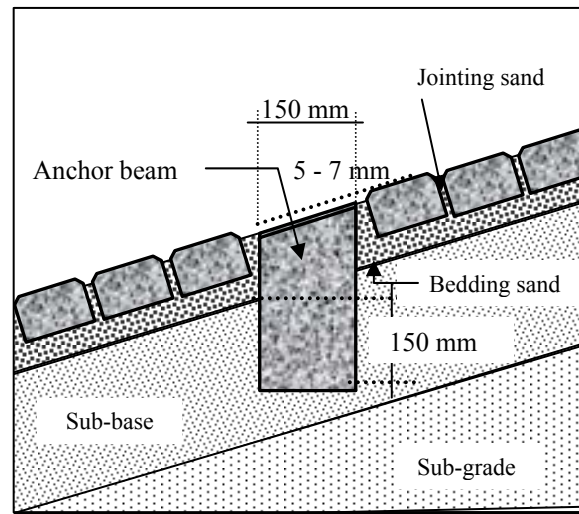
Detail construction of anchor beam (*CMA, 2000*)
